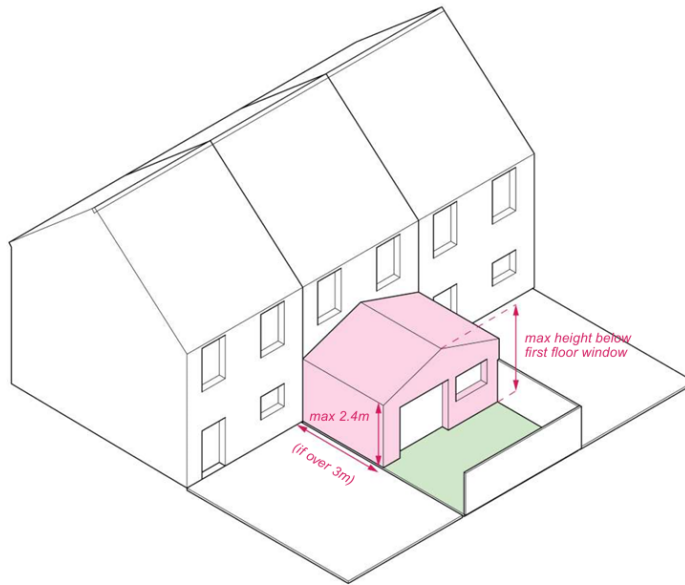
Terraced house with a full-width single storey rear extension, should be no higher than 2.4 on the boundary
